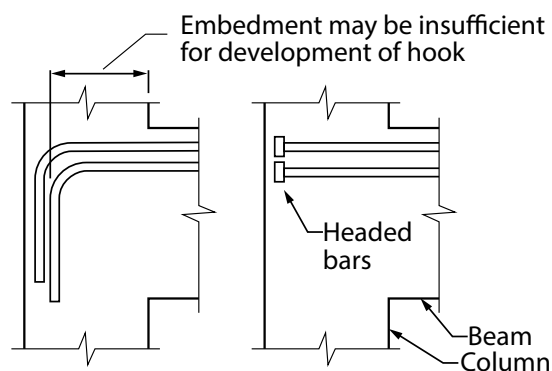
Headed reinforcement can help avoid congestion and ensure adequate embedment to develop bars. (Detail source: STRUCTURE Magazine, May 2011, "Tips for Designing Constructible Concrete Structures, Part 2." Image courtesy of Headed Reinforcement Corp.)
